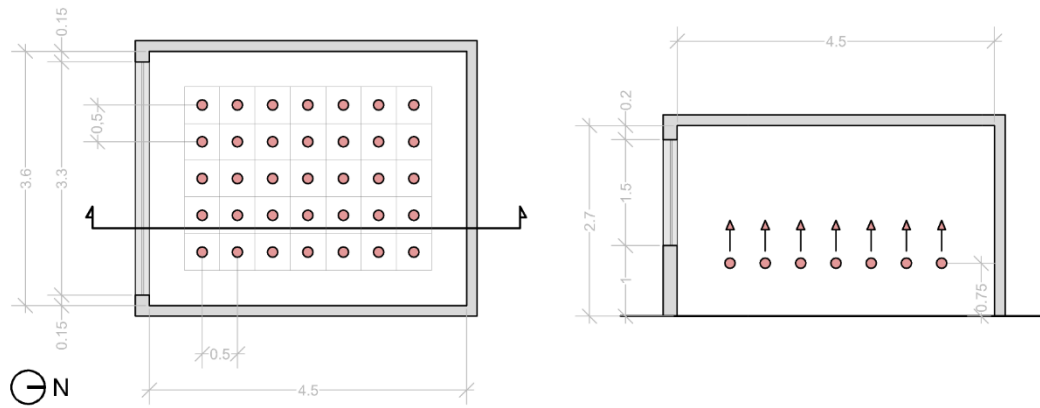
Enclosed office reference room and sensor points considered for lighting calculations: plan view and S-N section.
